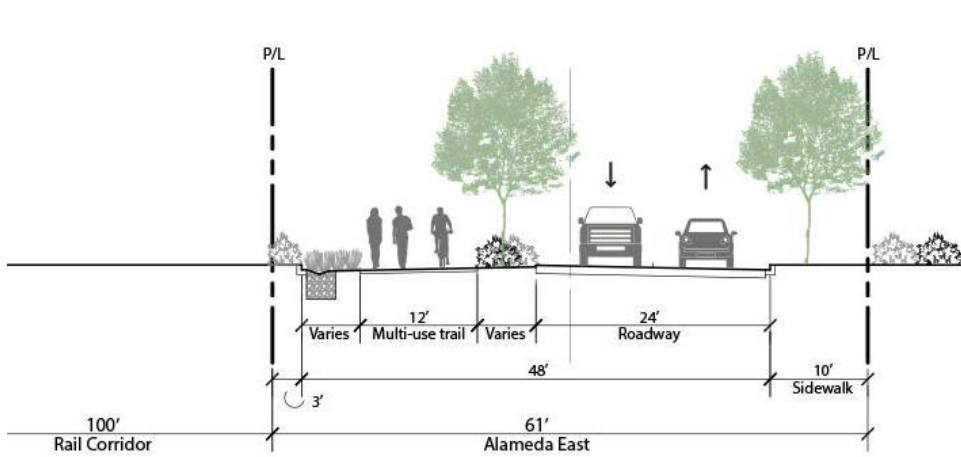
Alameda East Greenway Typical Cross-Section (Reduced Greenway Alternative).
